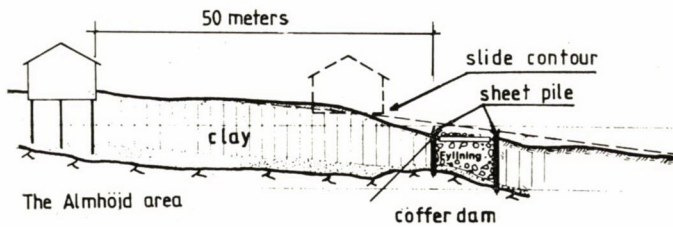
The circular sheet pile walls were primarily constructed to prevent local stability problems in the clay during placement of the road embankment
